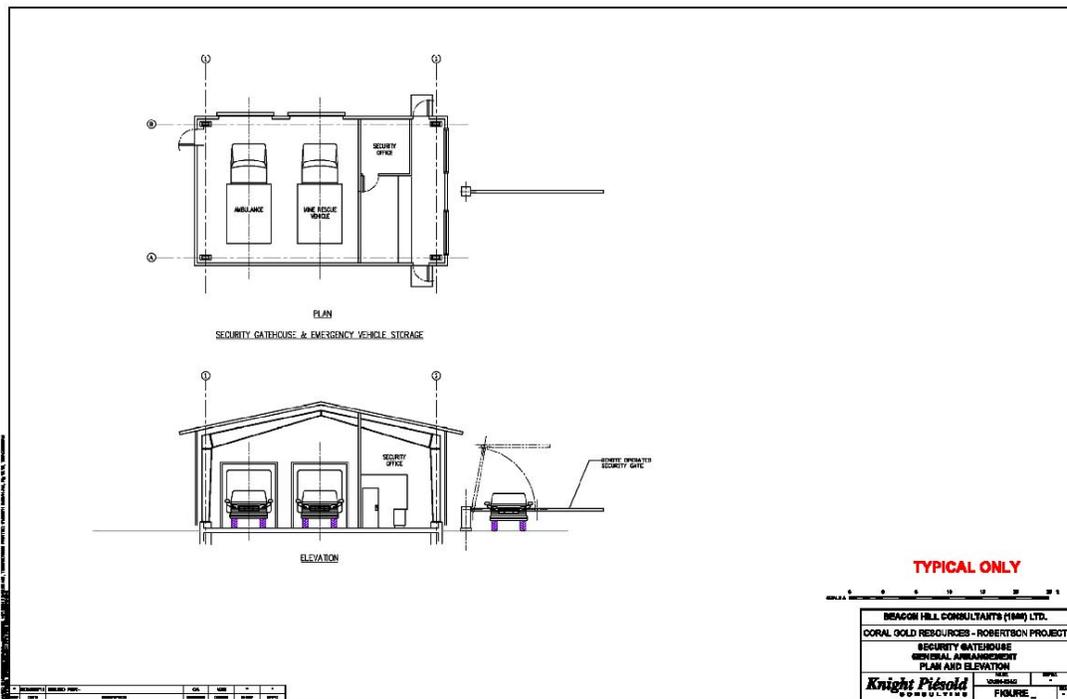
Security Gatehouse – General Arrangement Plan and Elevation
